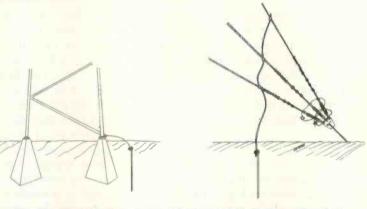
The base of the tower and all guy wires should be grounded with a large gauge wire secured to a long metal stake driven some distance beneath the ground.
